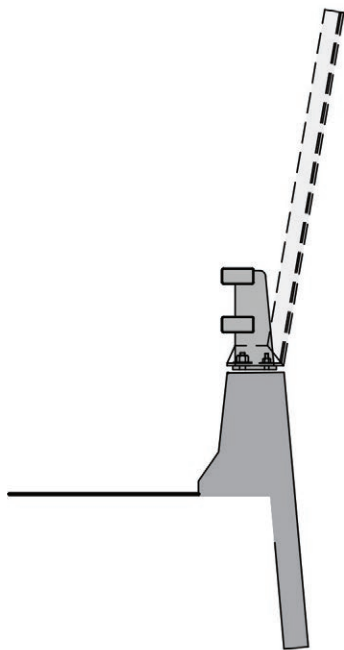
Detailed Profile of Medium Performance Concrete Barrier With Twin Rails
